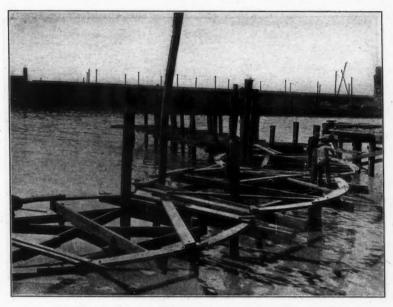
LAYING OUT TEMPLATES FOR DRIVING SHEET-PILING.
